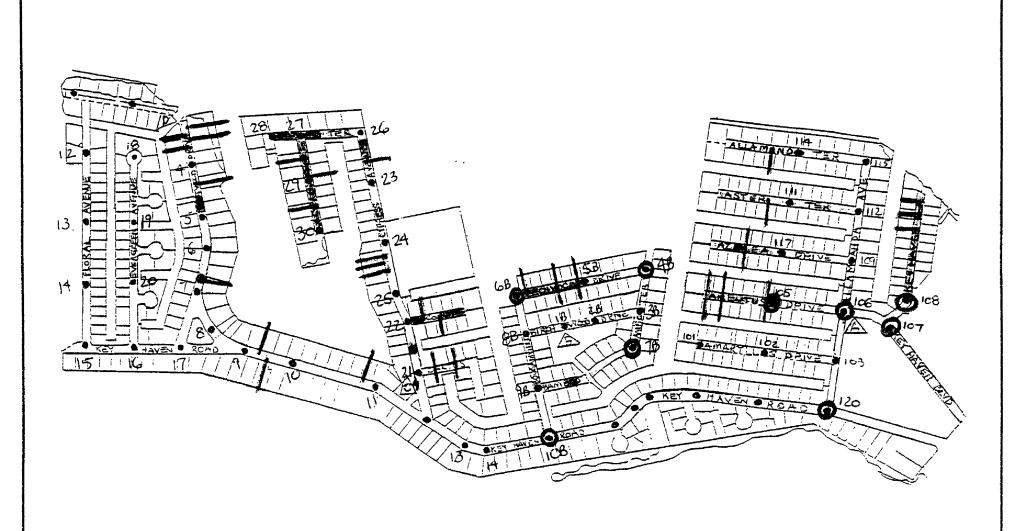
COLLECTION SYSTEM SITE PLAN
